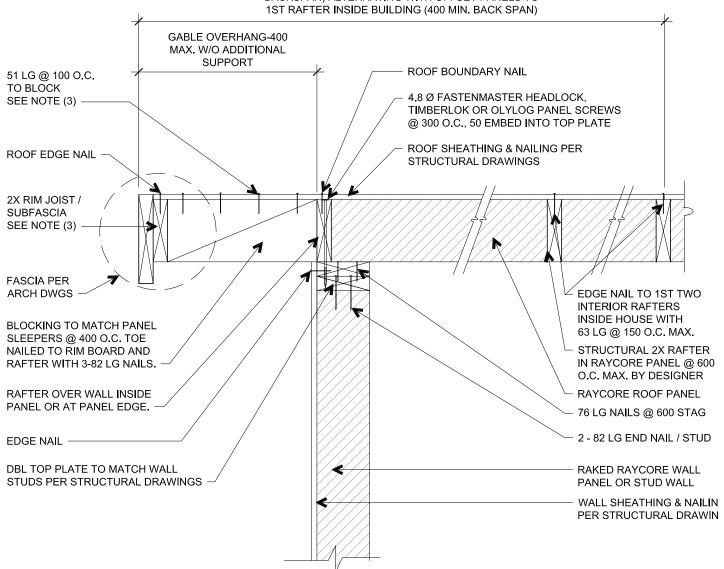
Raycore at gable wall w ladder fr-CAN KPL/Alpen Engineering, Inc.
